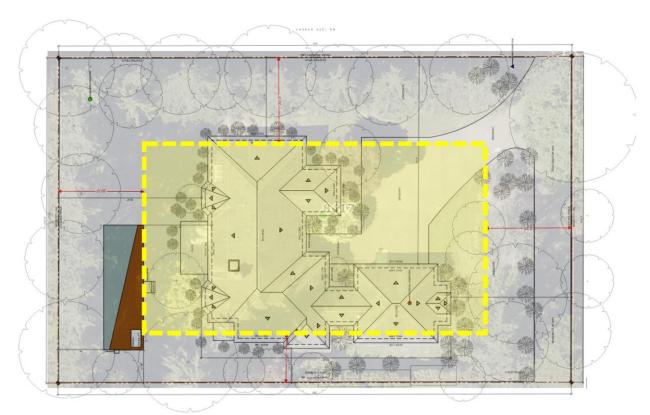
The available building envelope (building envelope = lot - setbacks) is shown in yellow
